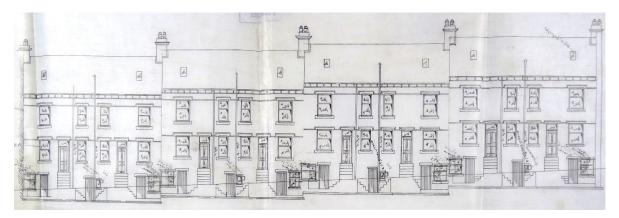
Elevation of the street showing the architectural design (Carby Hall and Dalby 1903).
